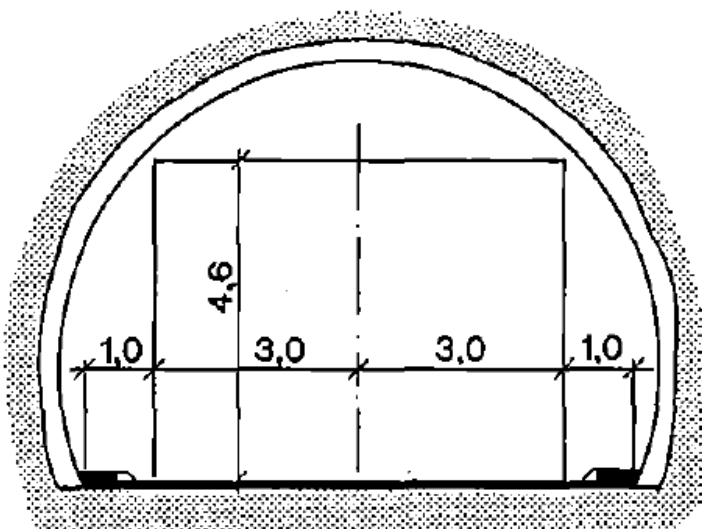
'T8' tunnel cross section. Source: NPRA Manual 021 – Road Tunnels (1992)
